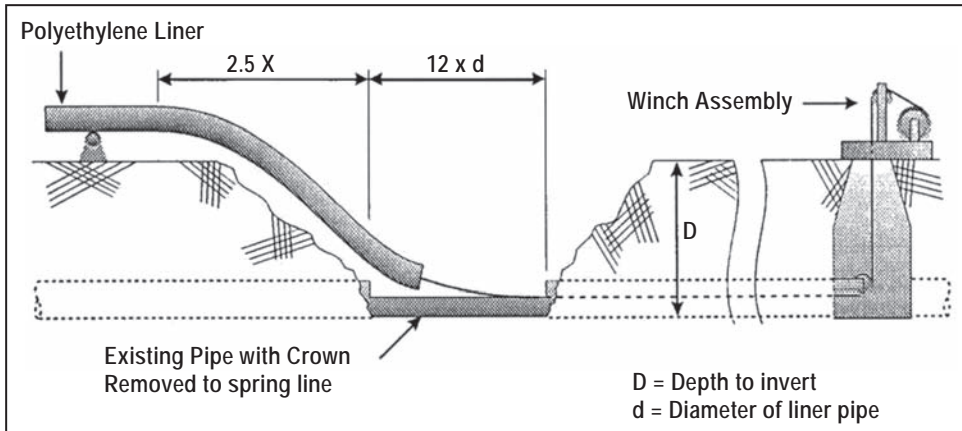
Insertion Shaft Dimensions for PE Pipe with SDR 17 (Bennett and Ariaratnam 2005)
